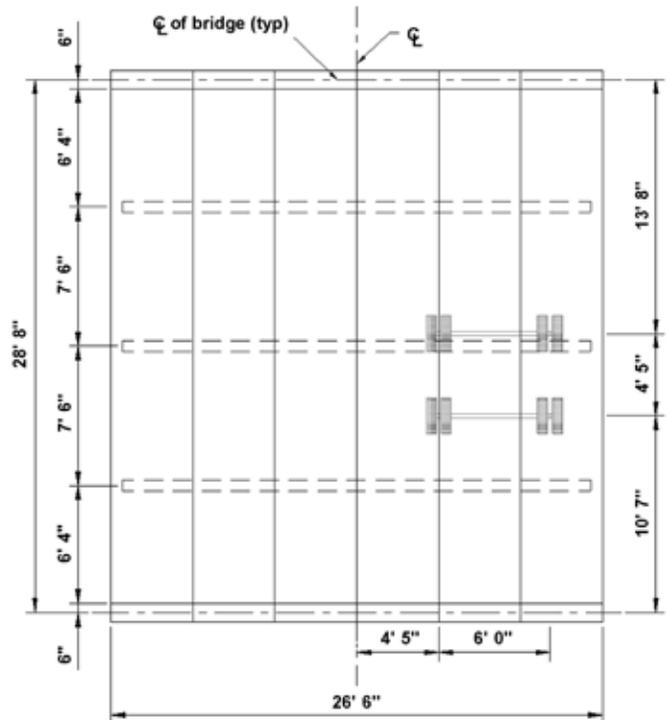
Controlling load position for Bolivar Bridge, plan view.
